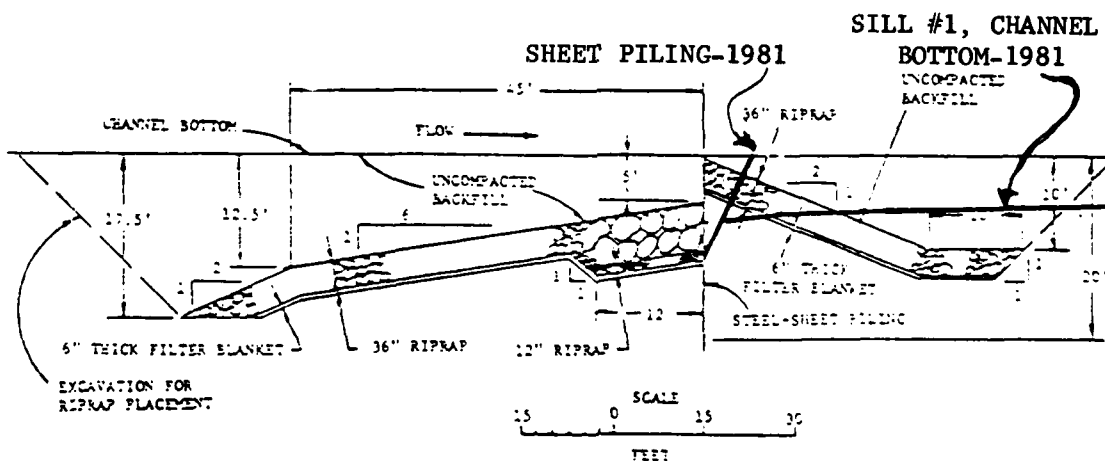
Floyd River at Sioux City, Iowa. Center-line view of sheet piling and rock sill at Sta. 2+90. Results of April 1981 survey superimposed.
